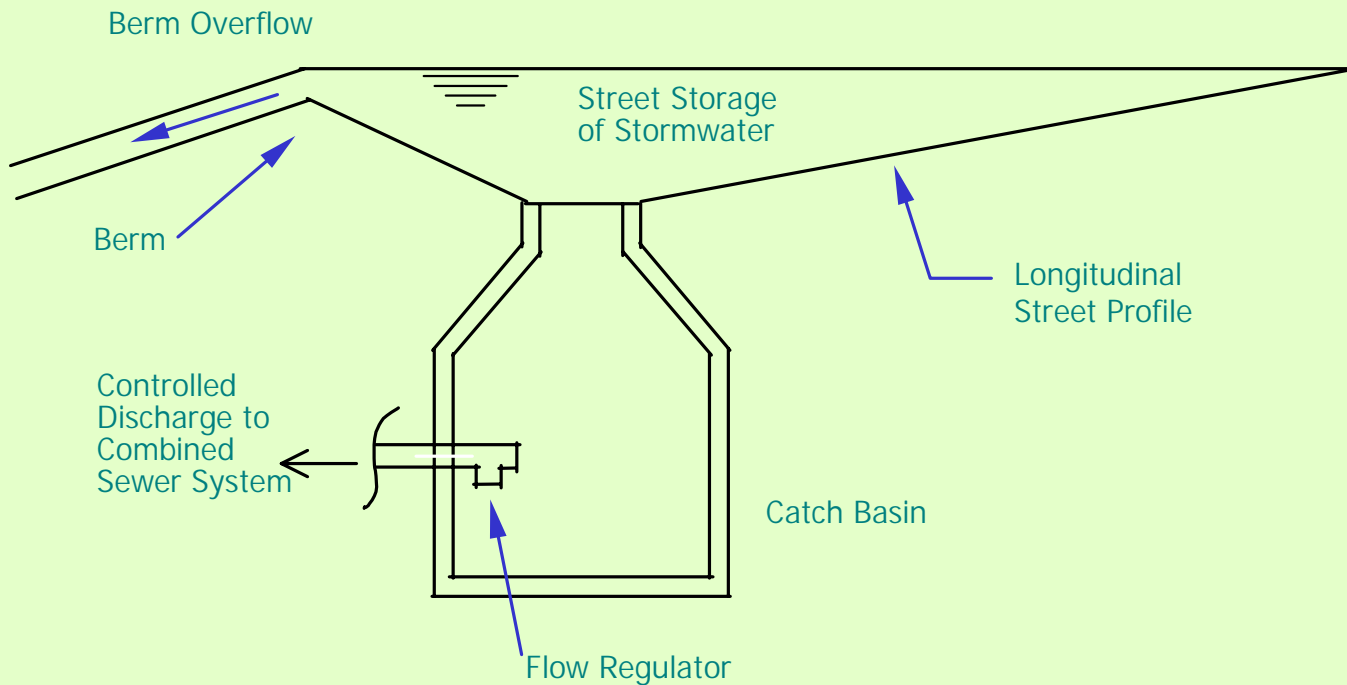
Schematic diagram of the street storage system (Note: not to scale and great vertical exaggeration).
